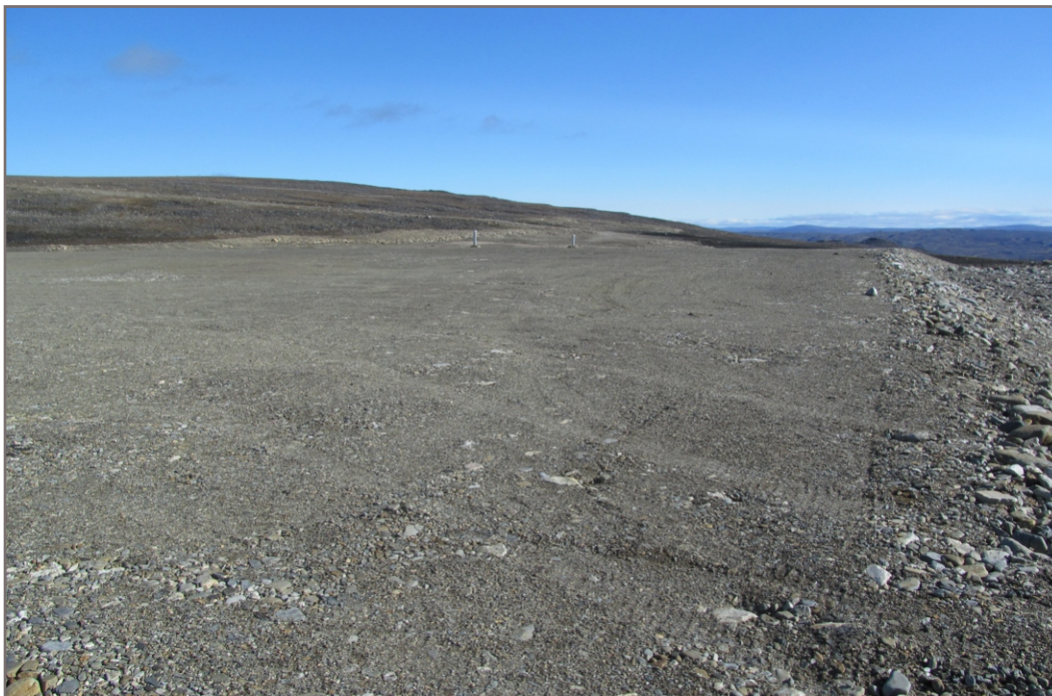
IMG 0144: Tier II Disposal Facility - View of the Facility looking southwest from the main road to the Station.
